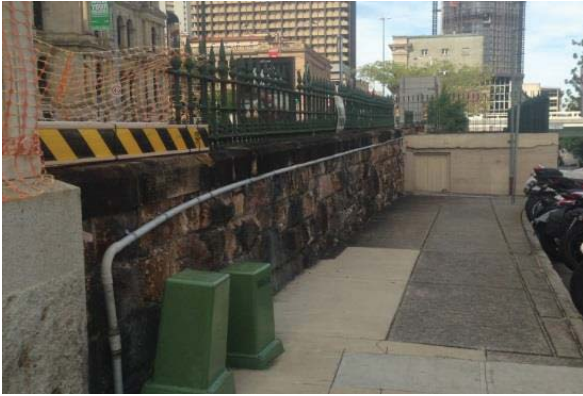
Looking Towards WWII Air Raid Shelter along Queens Wharf Road
